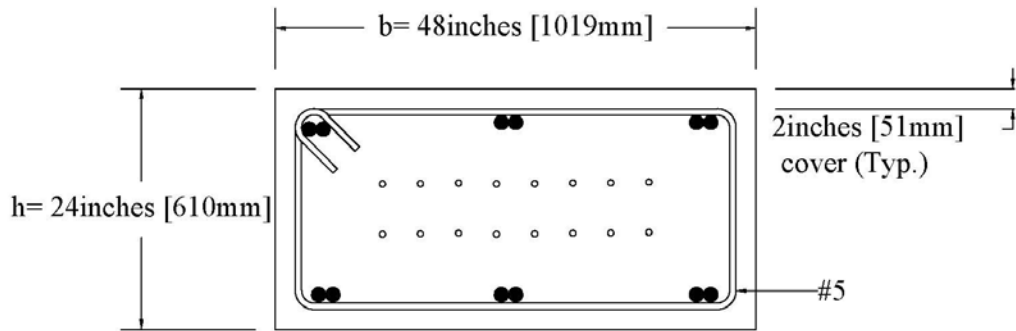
Cross Section at Splice Region with Transverse Reinforcement.
